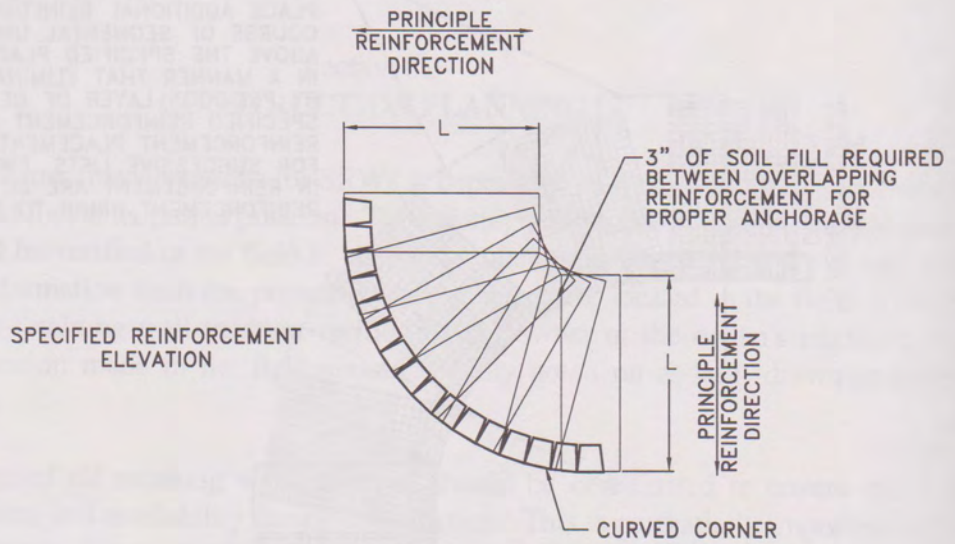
REINFORCEMENT PLACEMENT FOR CONCAVE CORNERS
